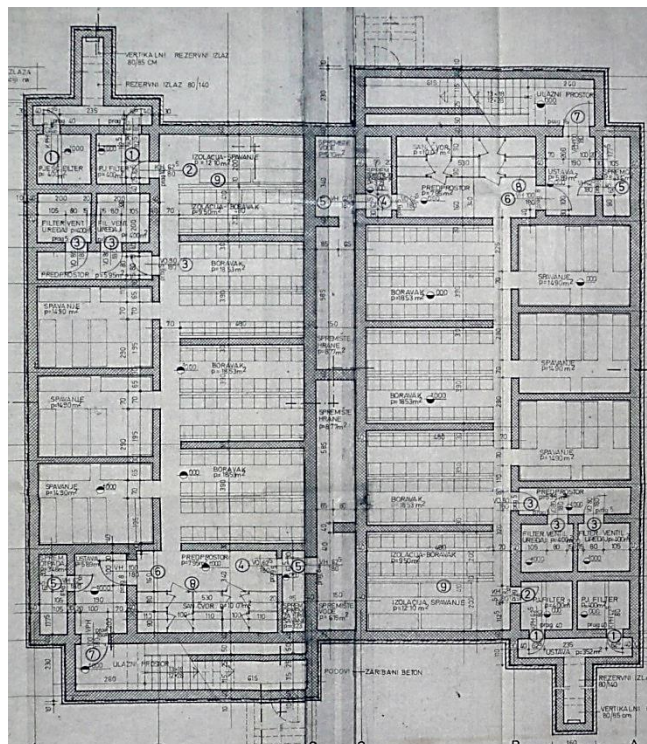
Plan of the fallout shelter Ruder Bošković [15]
